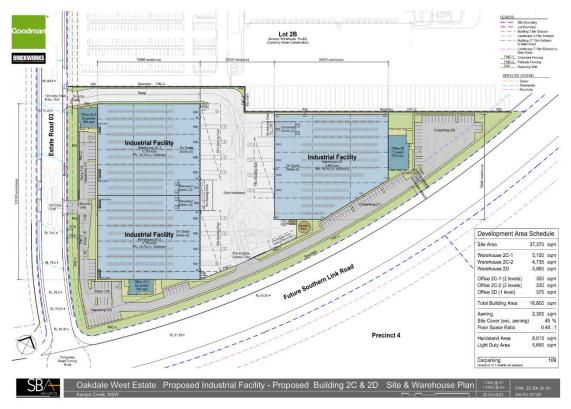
Amended site layout – Buildings 2C and 2D (Source: SBA Architects)
